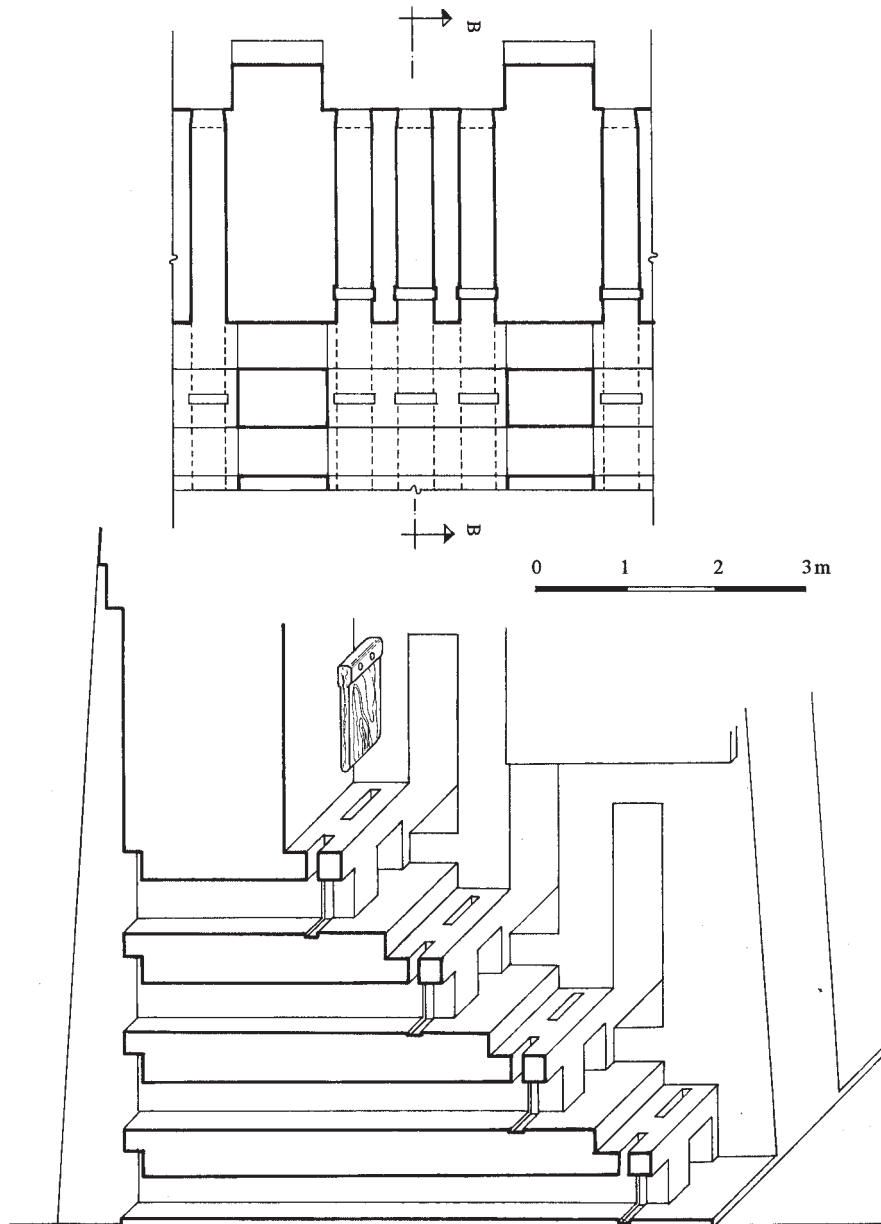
Sluice gate, detailed plan of central portion showing one row of shutter slots, and section B-B and perspective of central arch, showing the operation of the sluices.
